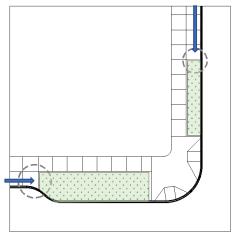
Unacceptable: Example of a Sidewalk Leading into a Stormwater Facility
